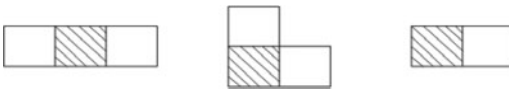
Possible plan configurations of a structural unit inserted into a building aggregate.
